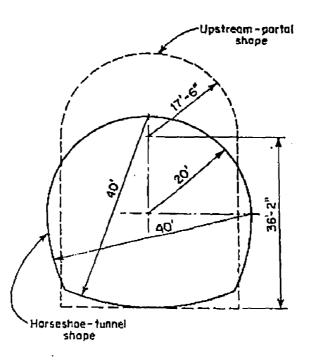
Dworshak dam-Cross section of tunnel
